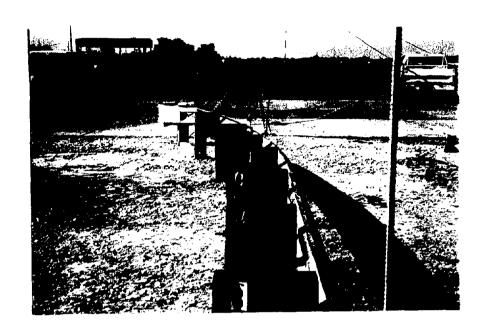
Modified MELT (terminal section) before tests 471470-35 and 36.
